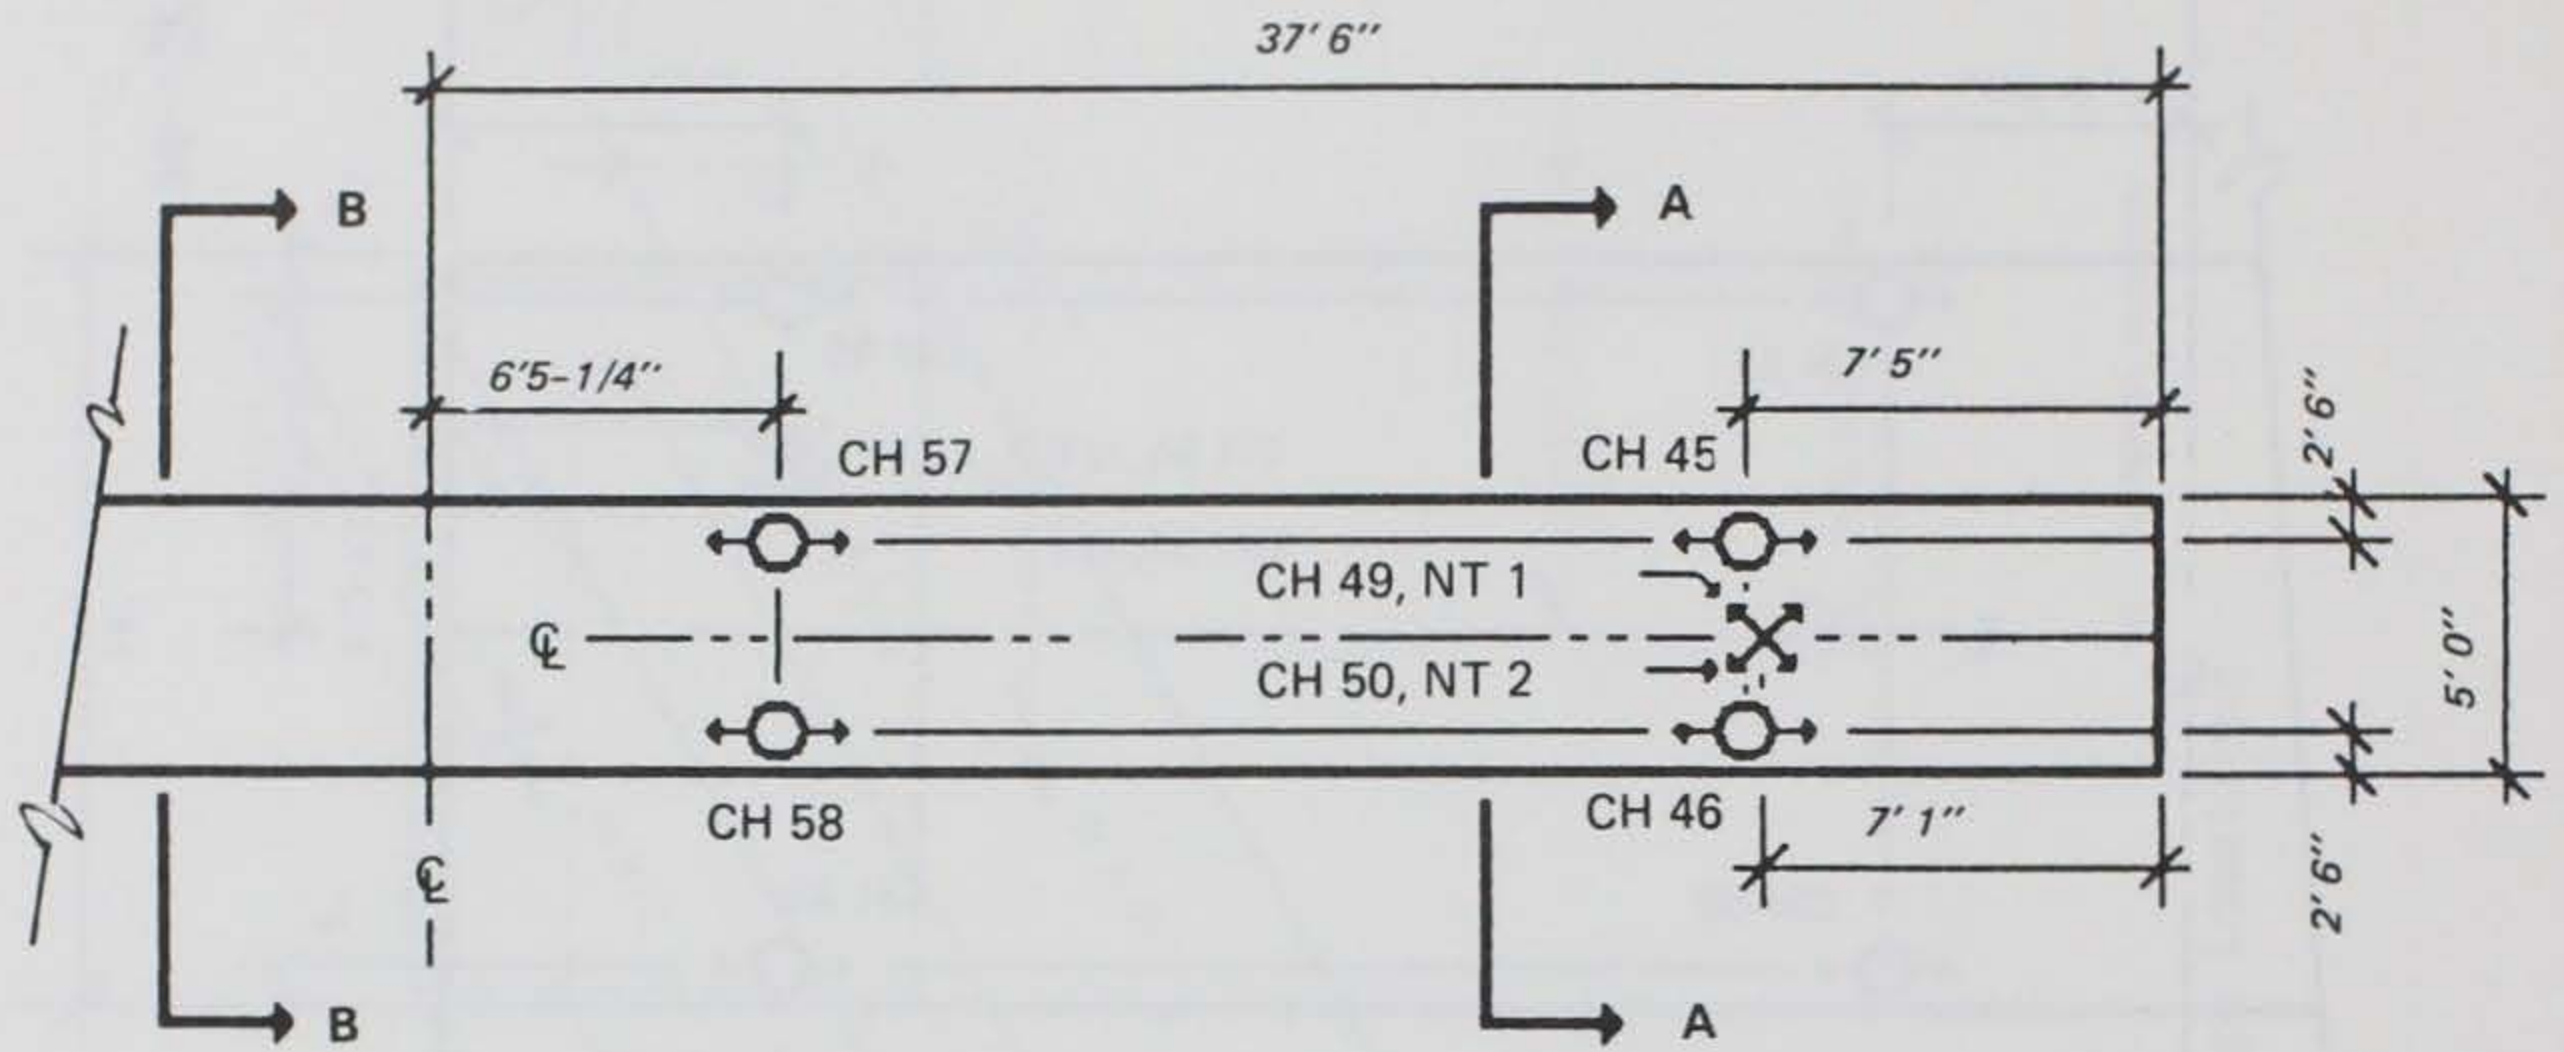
Concrete Strain Gage Layout, North Elevation
